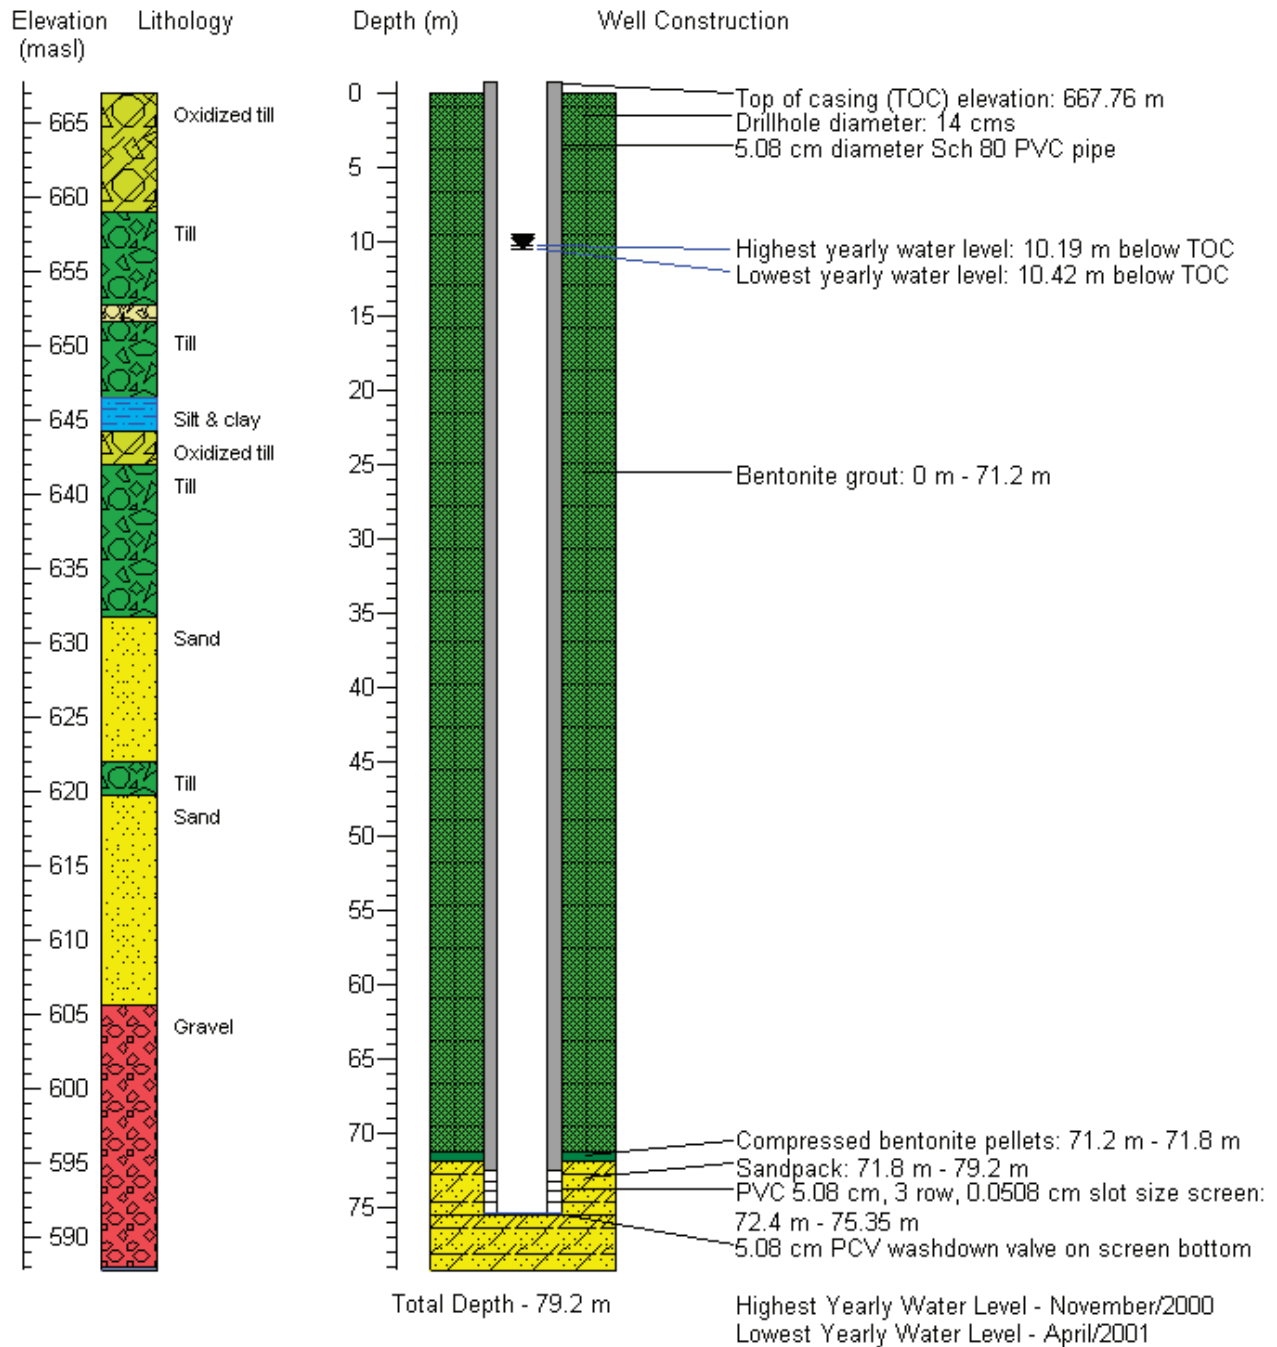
Piezometer construction details: WEPA 00-1-76
